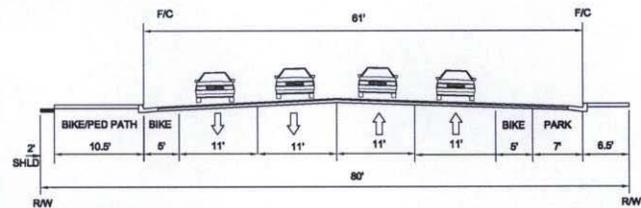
South Park Street Between Bercut Dr. and Crocker St. (looking east)
